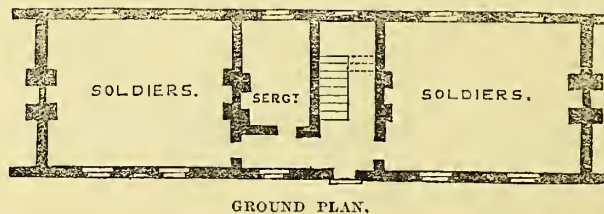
exhibits an example of this arrangement. It is a flat of one of the soldiers' houses in Templemore barracks. It shows the staircase, separate serjeants' room, and two soldiers' rooms 20 ft. 2 in. wide, with two windows on each of the opposite sides. These rooms are intended for 15 men each, but at that number they are considerably overcrowded, affording an example of excellent barrack construction, with overcrowding and a total want of ventilation. With 10 men per room, and proper means for renewing the air, these would make good barrack rooms; but, in the meantime, the necessity of observing these equally important conditions for health has not been recognized, affording an example of the absence of sanitary method *within* barrack buildings similar to what we have shown to exist *without*.
